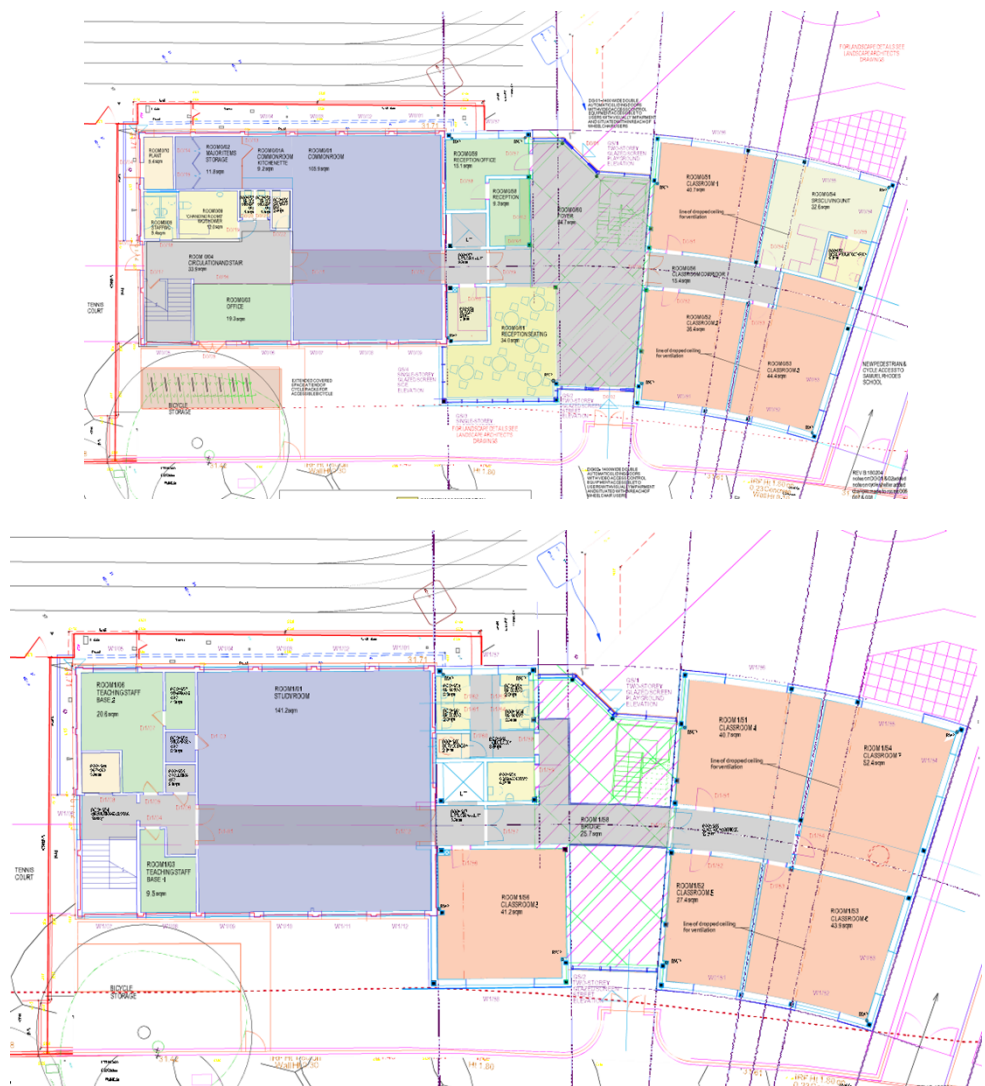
Proposed floor plans showing layout at both ground and first floor levels
